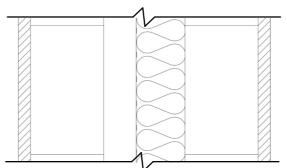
Double wall constituted by: Plaster (1,5 cm) | Brick (9 cm) | Air box (4 cm) | XPS (6 cm) | Brick (9 cm) | Plaster (1,5 cm).
